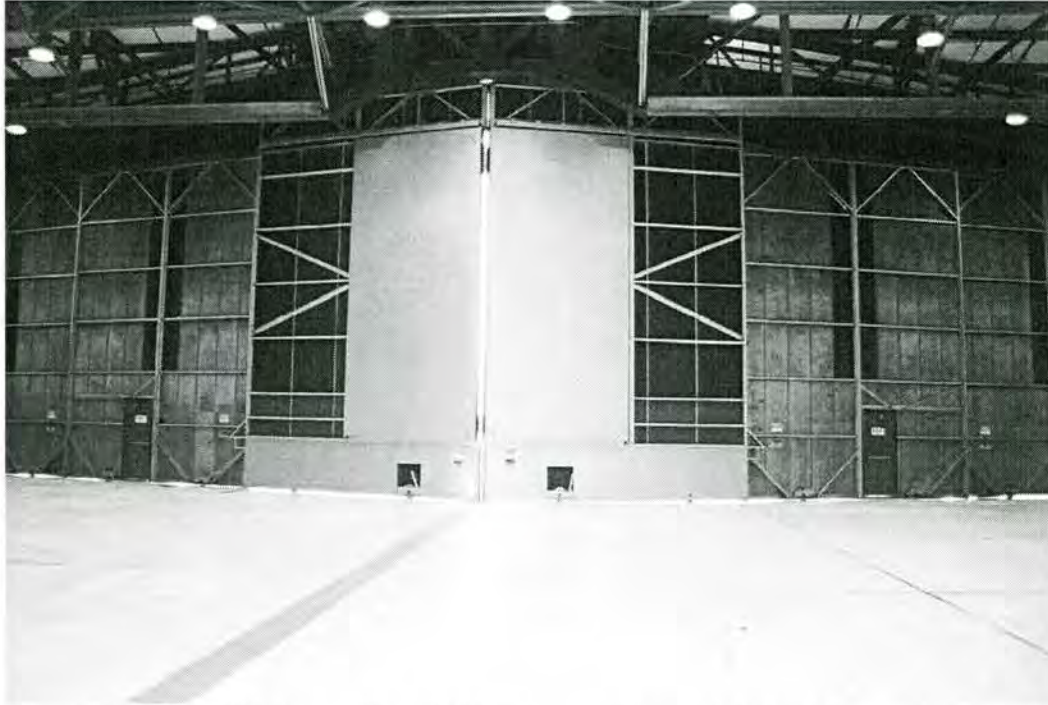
Building 4828, interior of front (flight line) entrance (Photograph by Joe C. Freeman, 2004).
